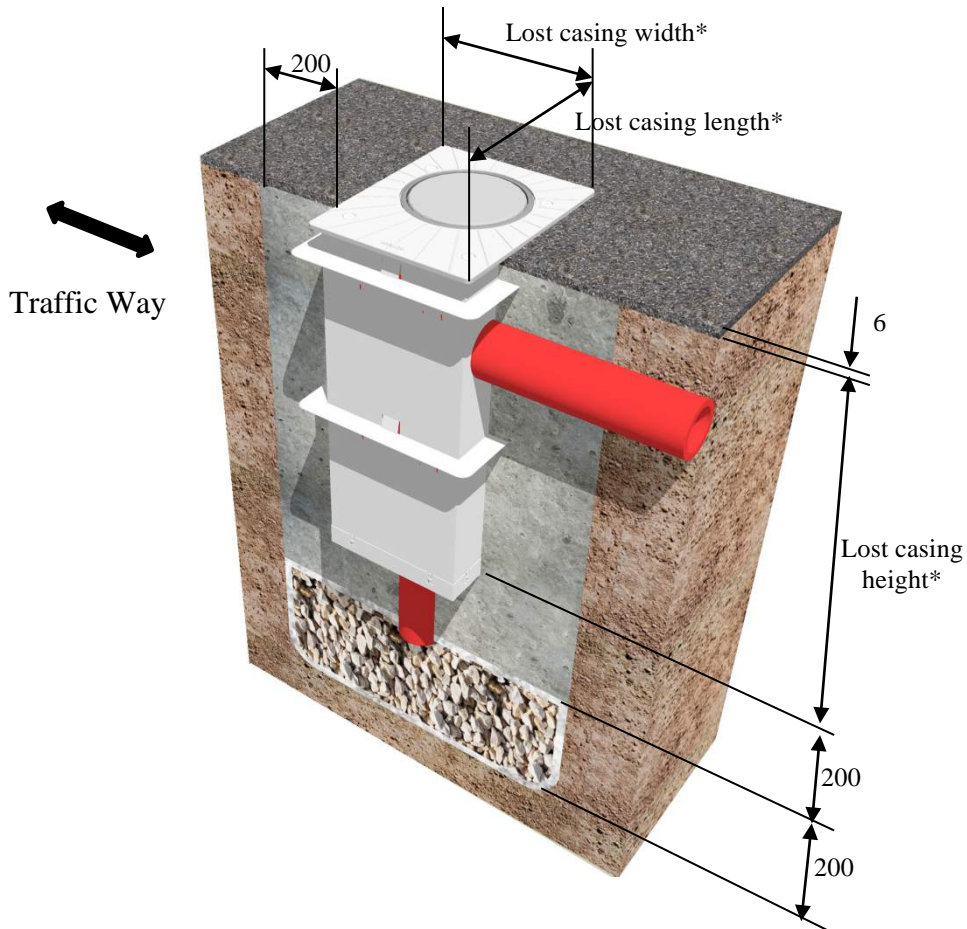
Cross section view of an installed G6EVO bollard (with lost casing)
